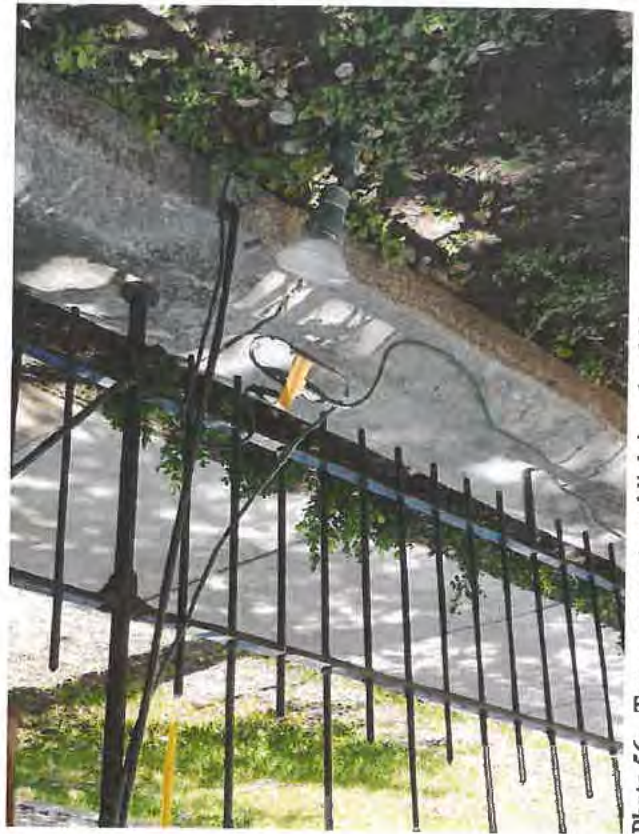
Temporary east yard lighting should be replaced with code-compliant permanent installation.
